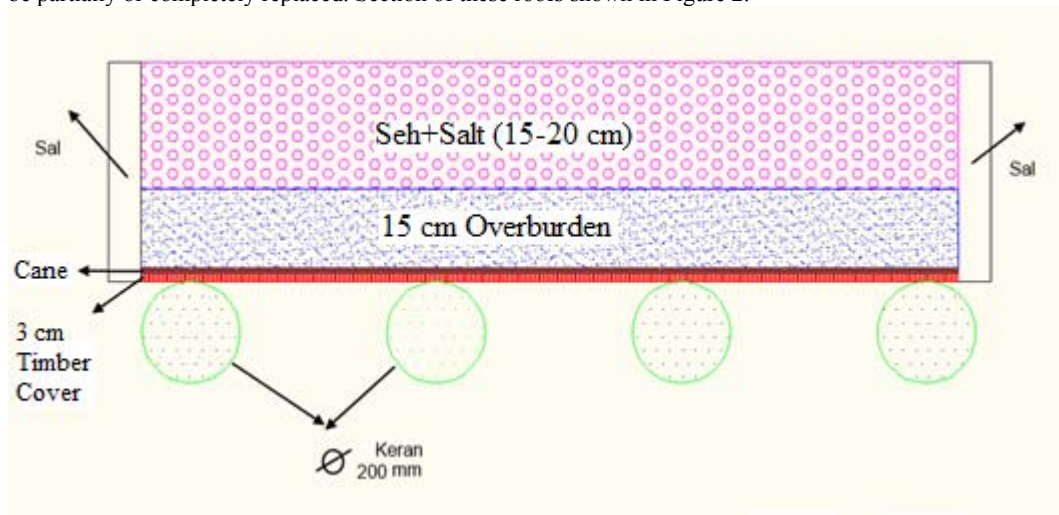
Historical Soil Roof Section of Bitlis Houses [3]
